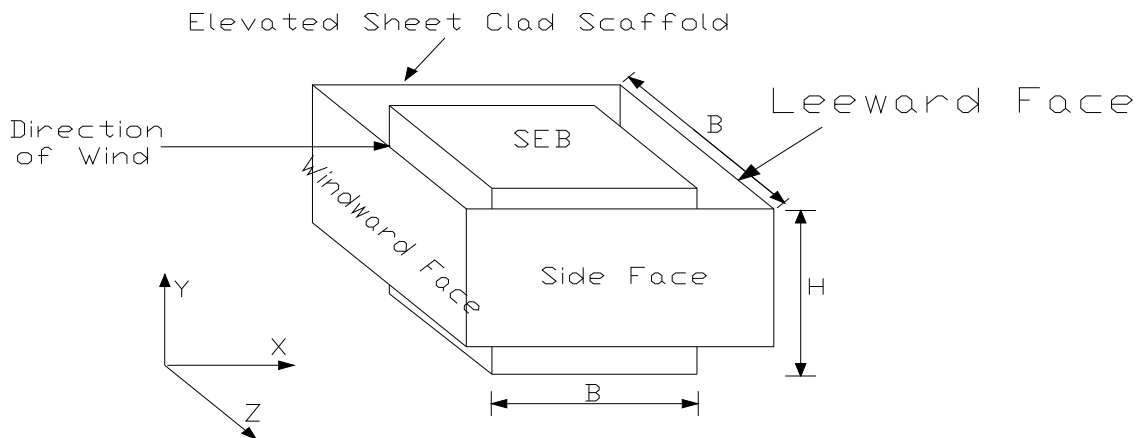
Scaled SEB surrounded by elevated impermeable sheet all around
